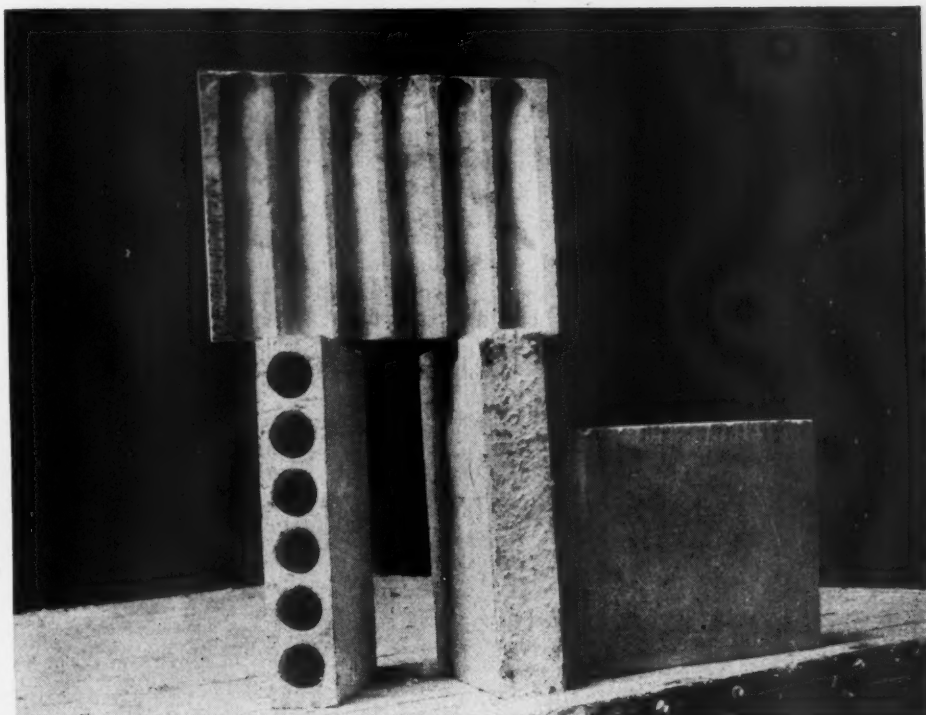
Types of tile cast on machine shown in Fig. 8.
